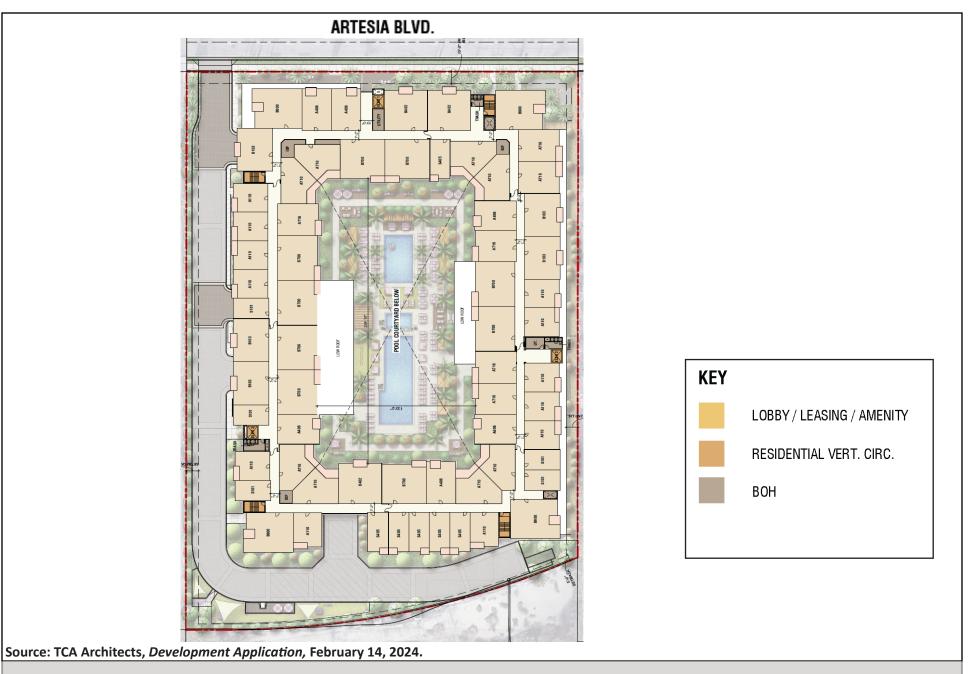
E: CONCEPTUAL SITE PLAN - LEVEL 4
